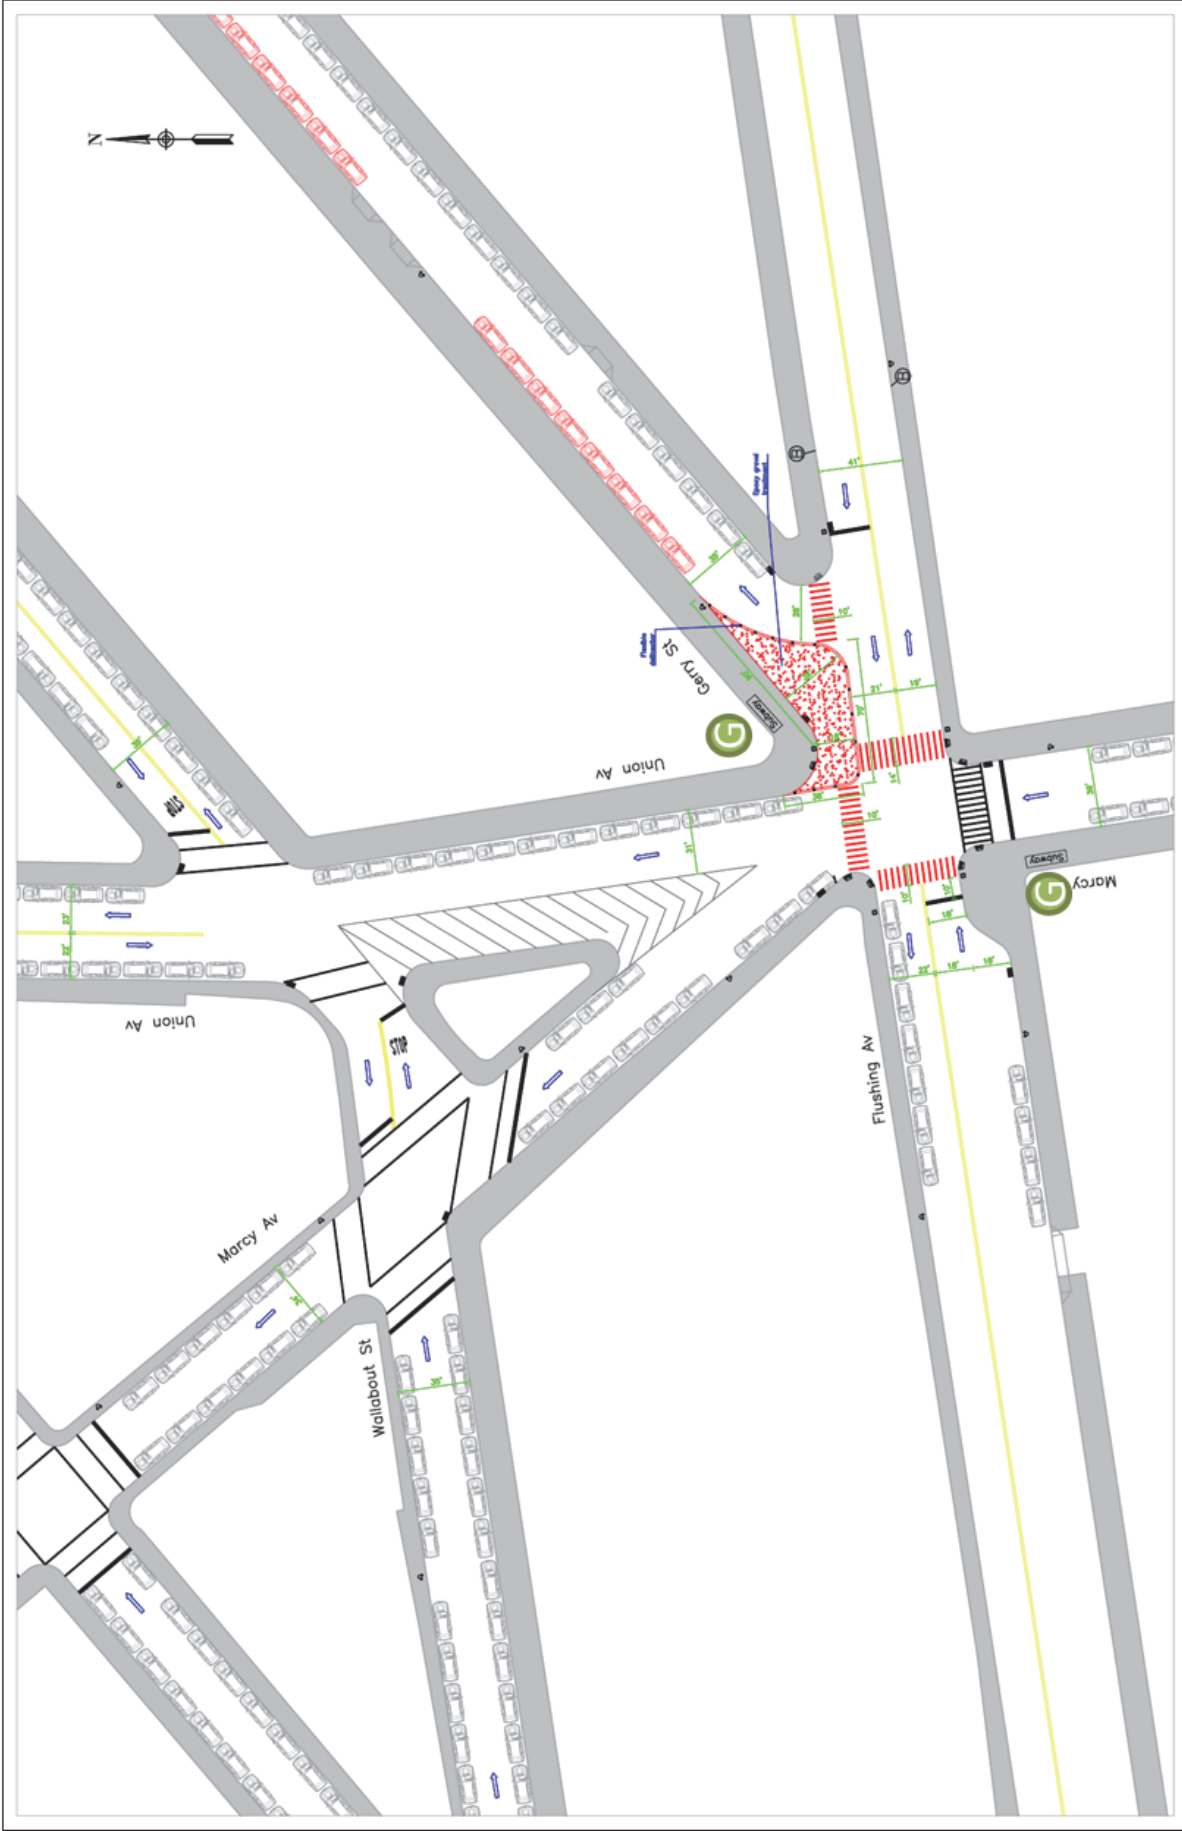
Flushing Avenue and Gerry Street - Proposed
